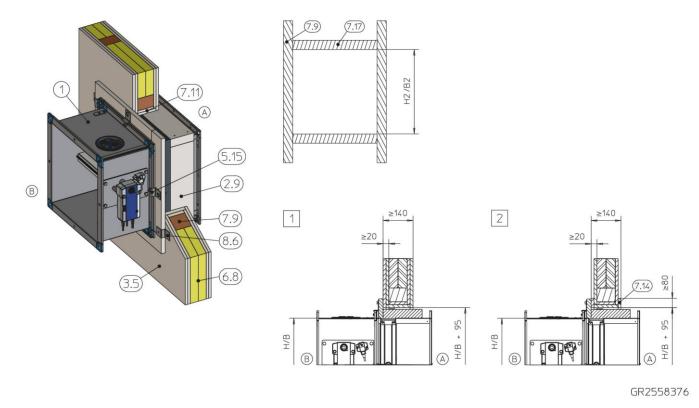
Dry mortarless installation into a half-timbered construction, with installation kit ES
